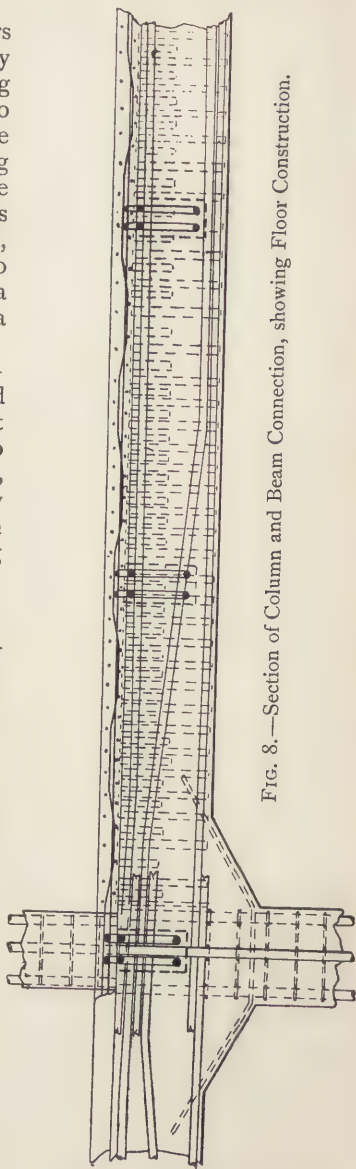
Section of Column and Beam Connection, showing Floor Construction.
